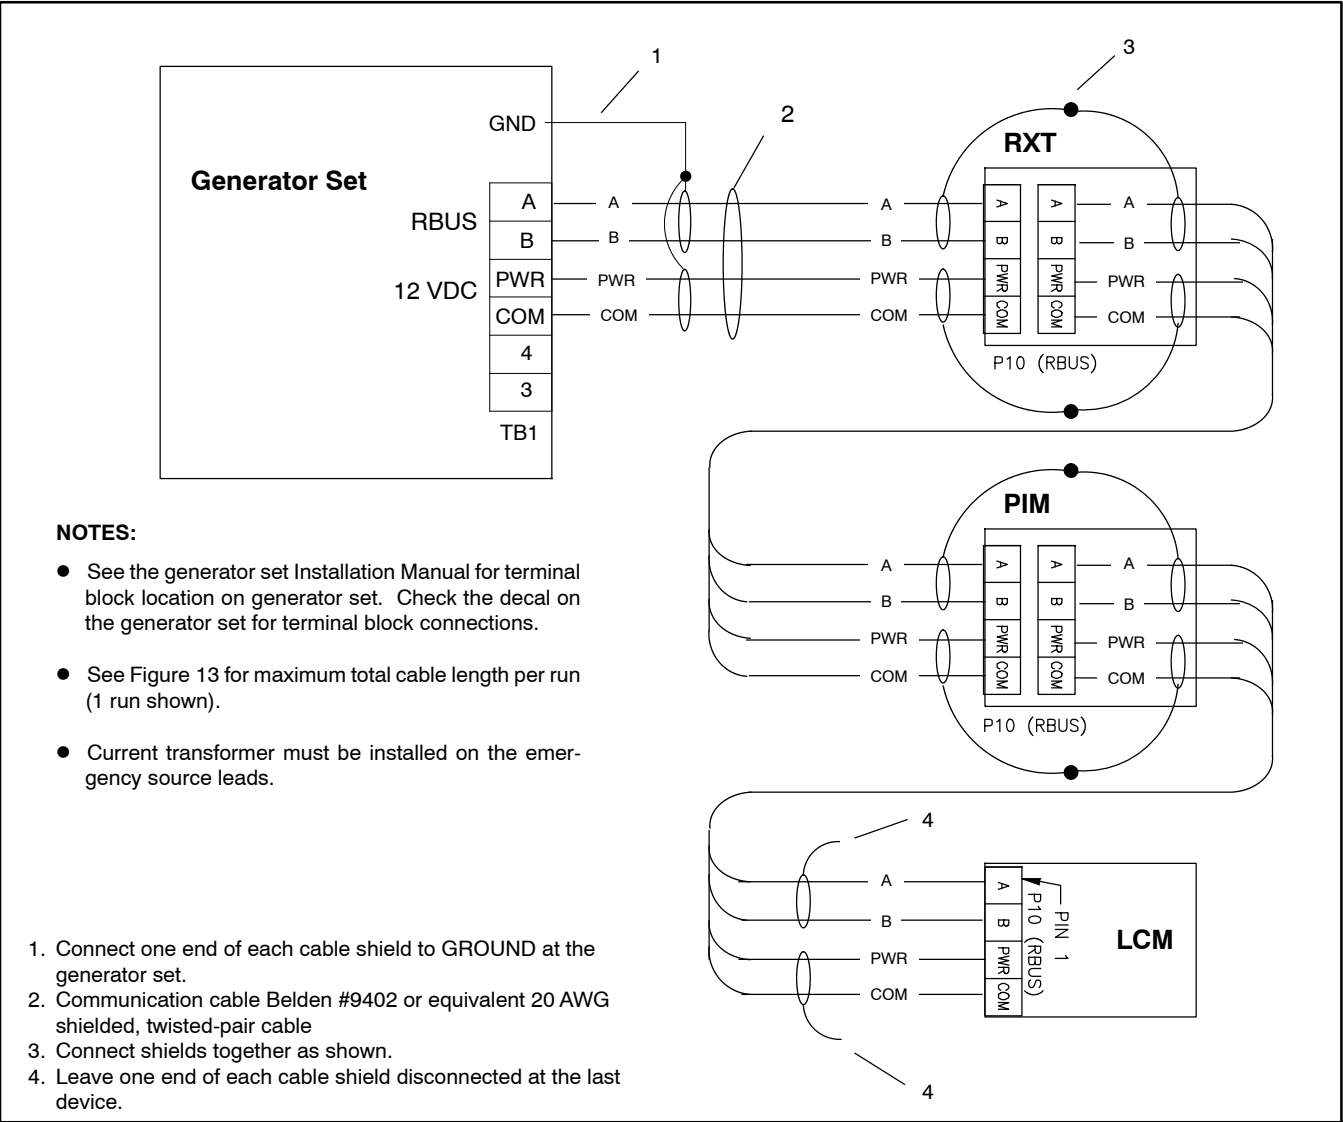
Communication Connection Details with Model RXT Transfer Switch
